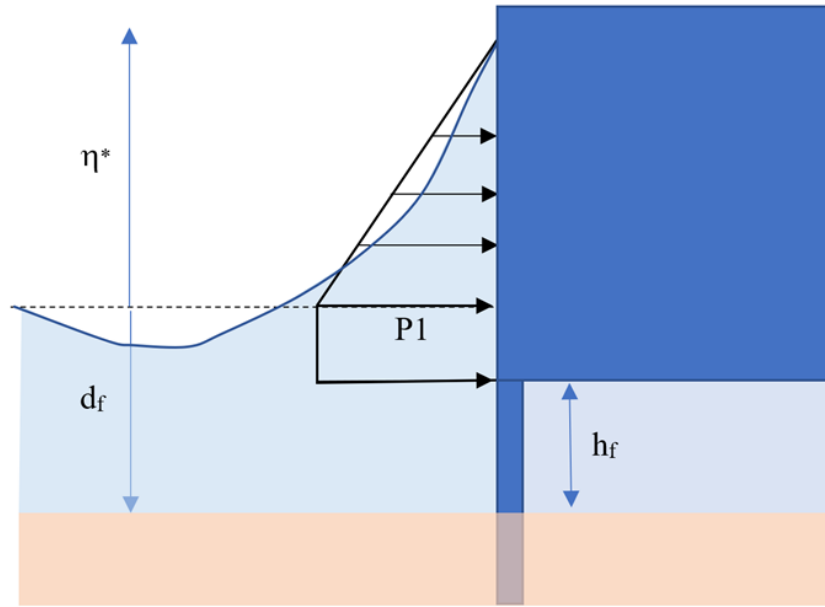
Loads on elevated wall panel, from method of Goda (1985)
